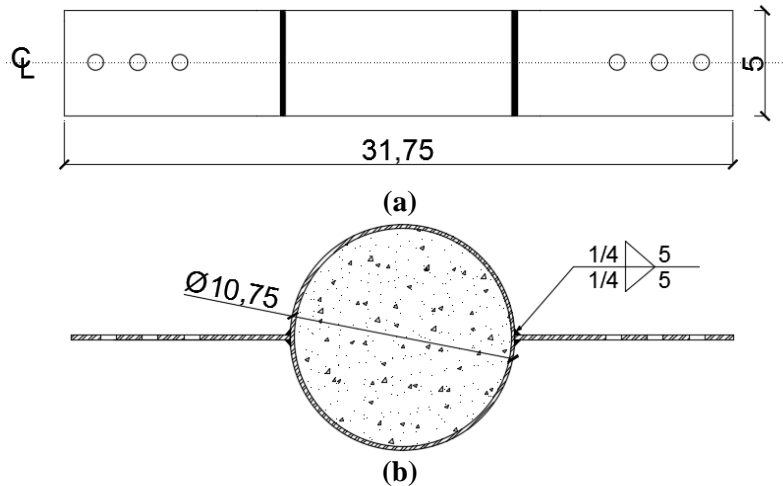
Test specimens D10.75L5: (a) top view; (b) side view (unit: in.)
